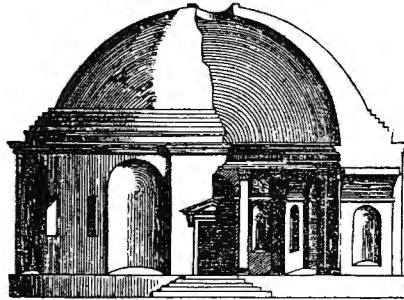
Serlio. Fifth Book: Cut-away section of a church with circular plan.
